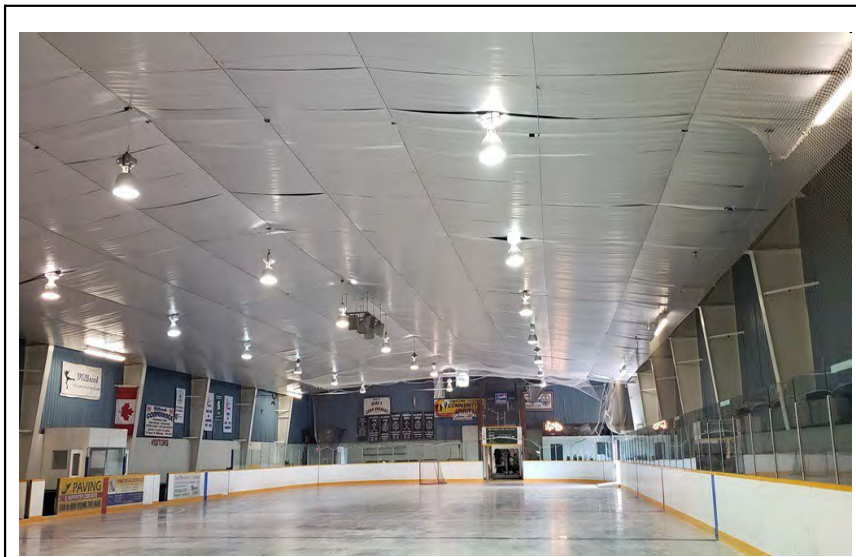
Roof Deck Insulation covering Pre-Engineered Frames
